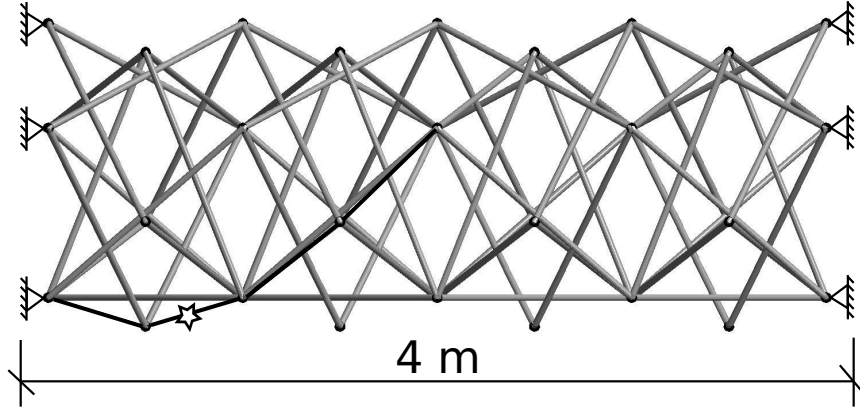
Elevation view of 1/4-scale deployed structure showing end conditions following prestress. The location of discontinuous cable damaged for testing is indicated by a star. For clarity, struts (in grey) and only some cable segments (in black) are shown.
